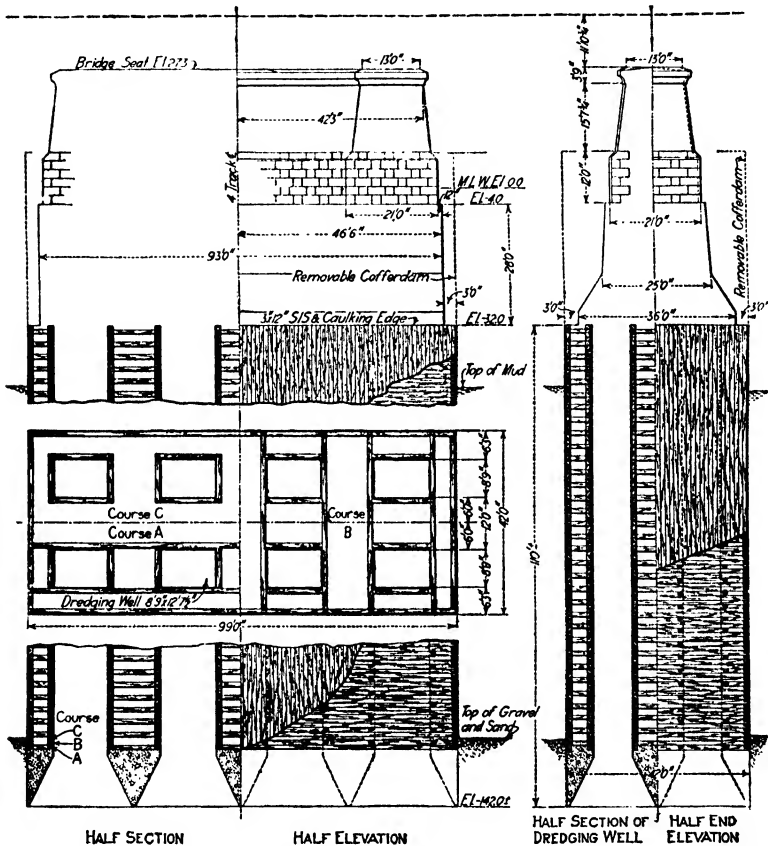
Timber Open Caisson with Dredging Wells of New Thames River Bridge at New London, Conn.
